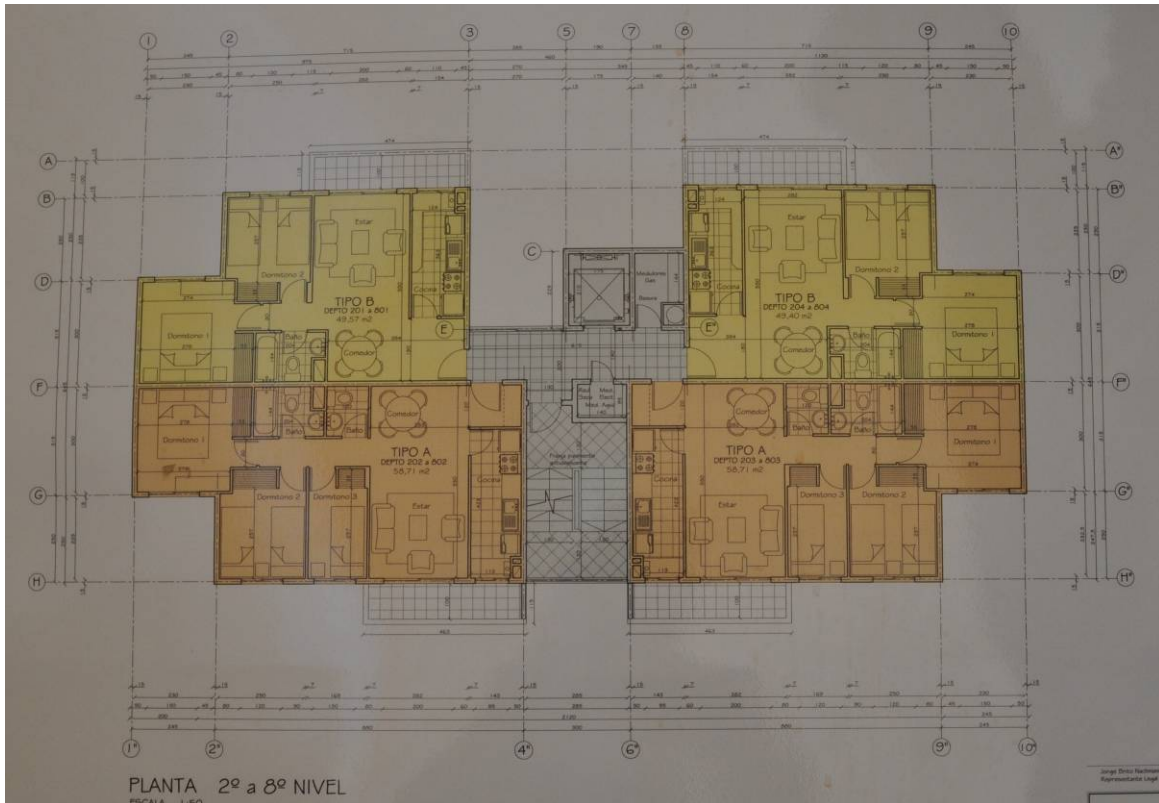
Architectural plan of the Riesco, Errázuriz, Montt, and Bulnes buildings (image taken at 1615 hrs on 3/17/2010).
